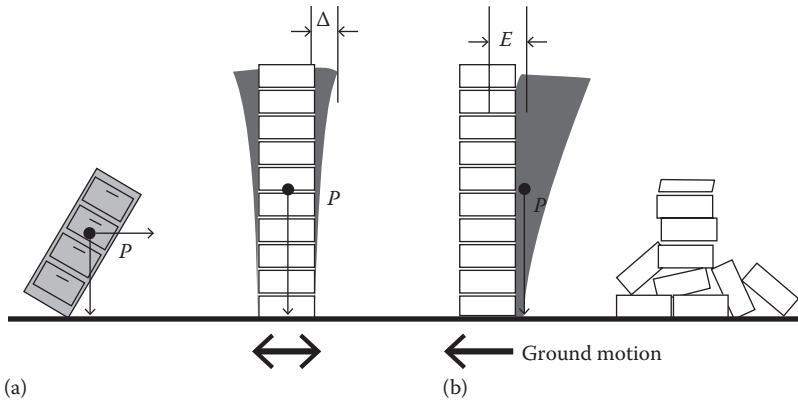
Why buildings generally fall down, not over: (a) filing cabinet and (b) building structure.
